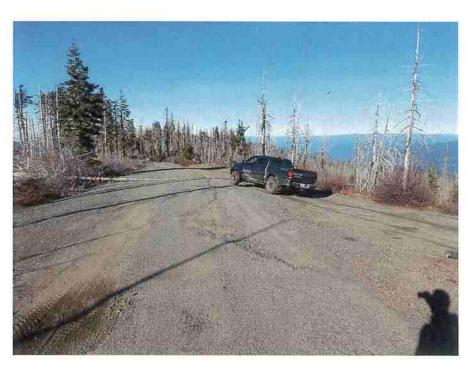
RP 1. Vehicle traveling north, photo taken facing north.
